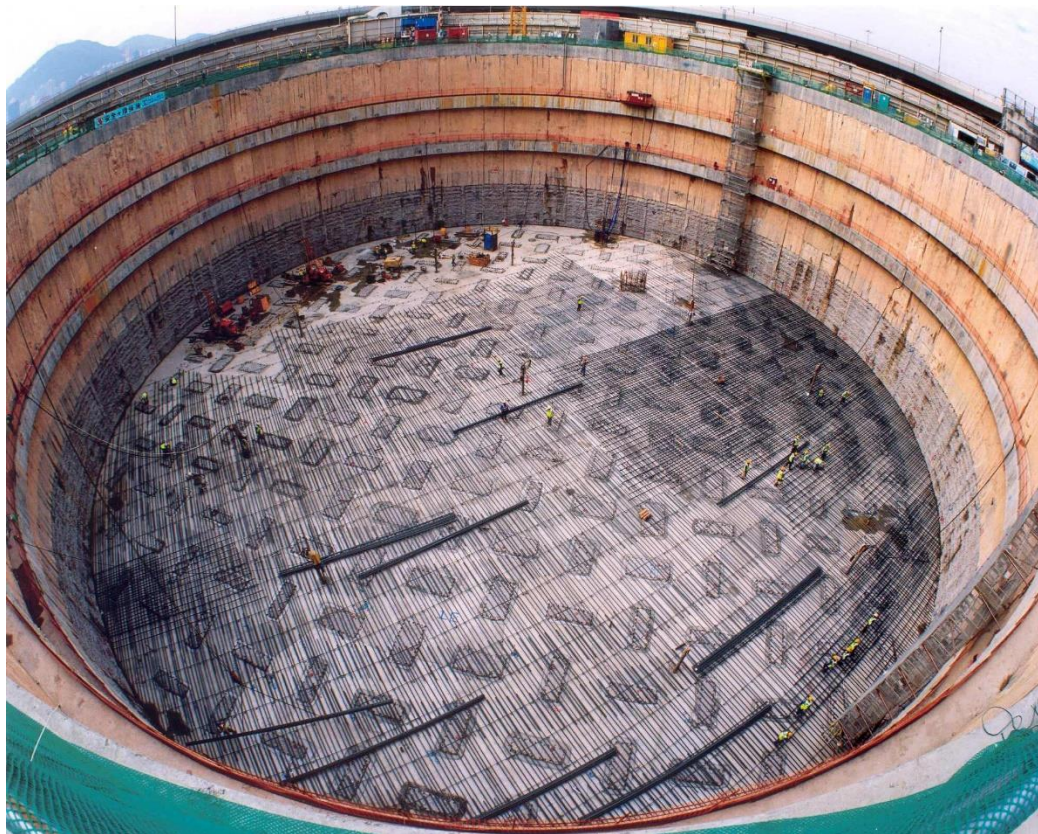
Circular Shaft for Basement Construction at International Commerce Centre
